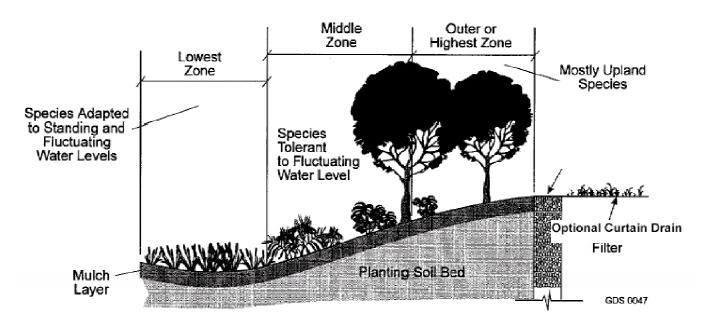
Planting Zones for Bioretention Facilities (MDE, 2000)
